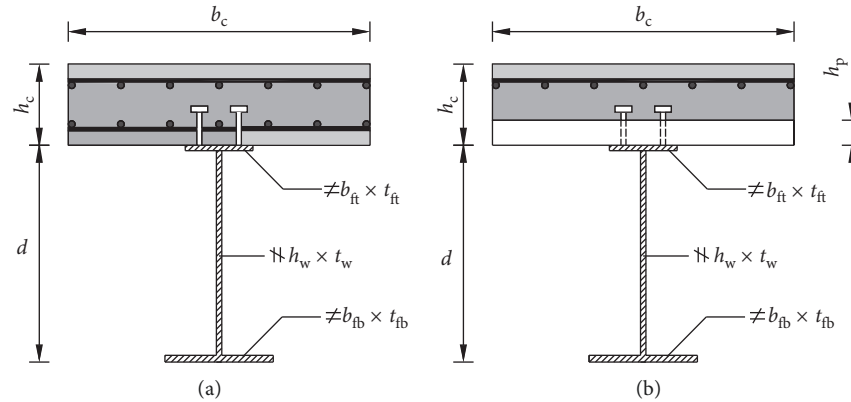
Typical cross sections of composite beam with (a) full concrete slab and (b) composite slab (on profiled steel sheeting).
